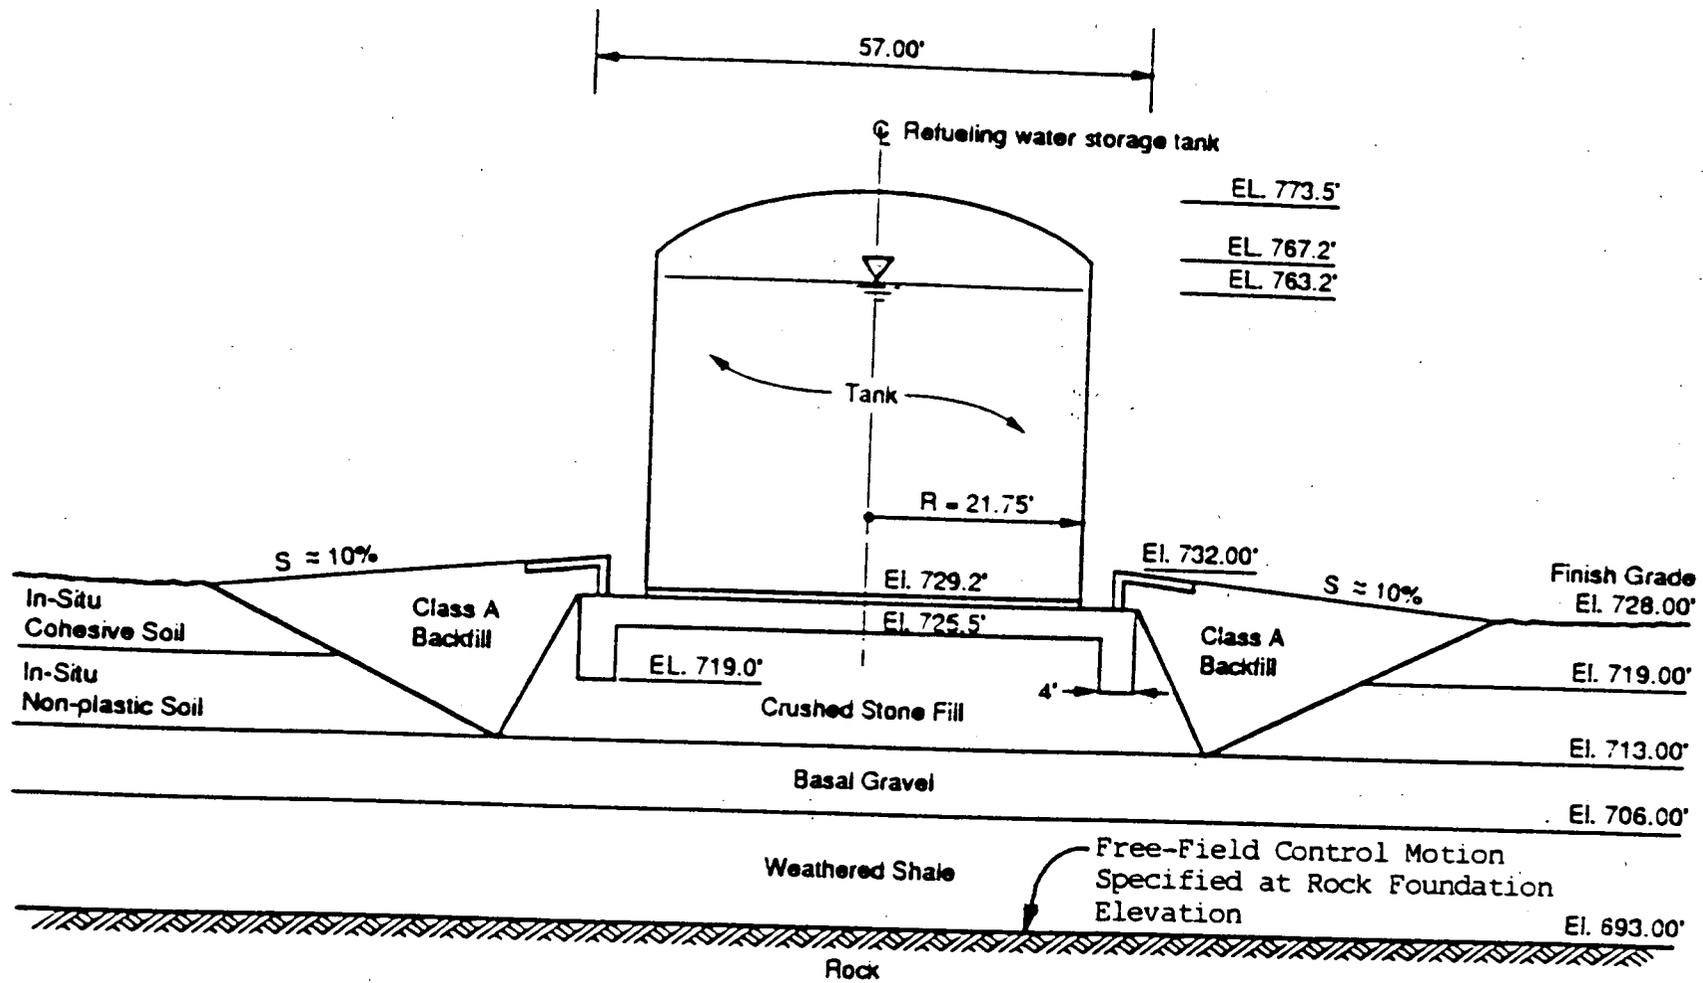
Cross Section of Refueling Water Storage Tank and Soil Foundation (Ref. 6)
